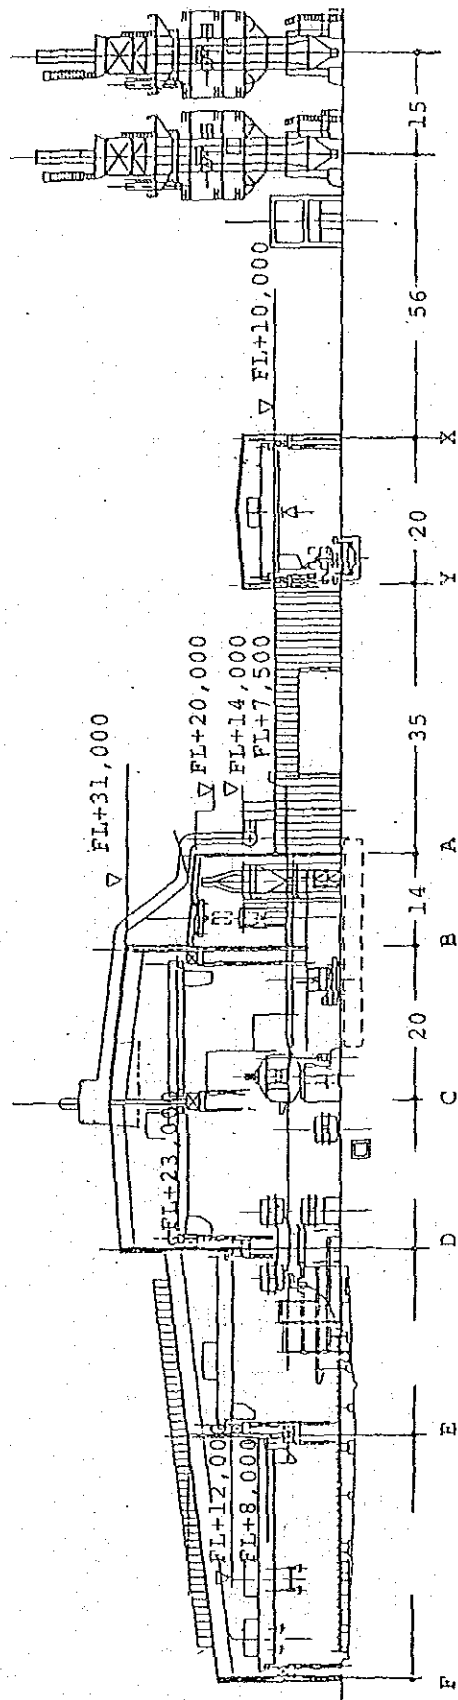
The Schematic Arrangement of Steelmaking Shop. (Section)
